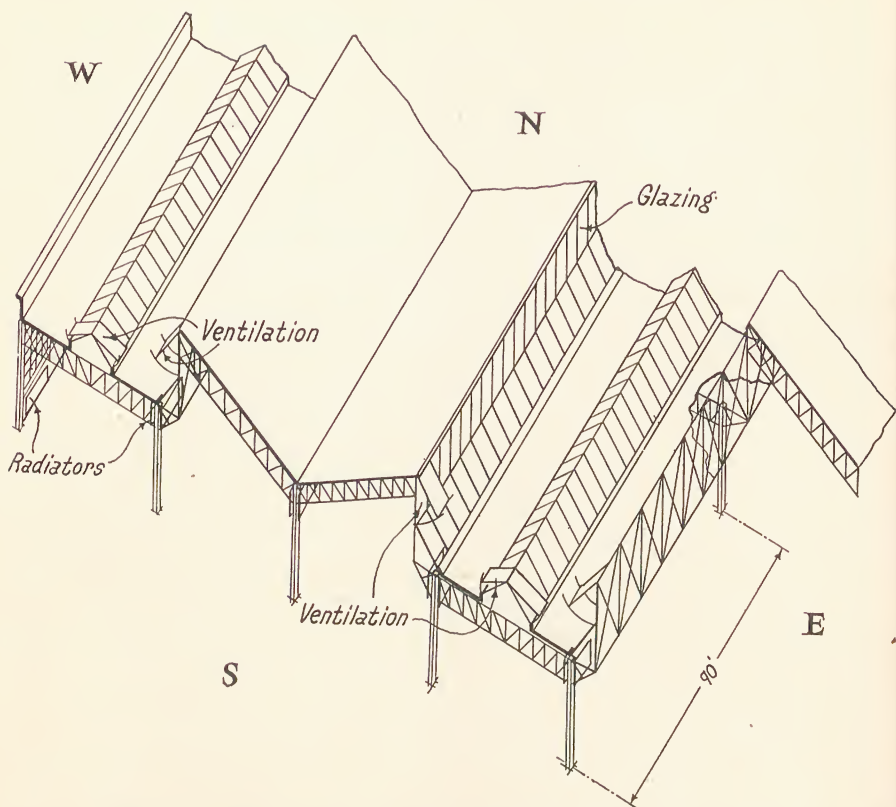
ENLARGED DETAIL OF ROOF CONSTRUCTION FOR FACTORY SHOWN IN THE THIRD DIAGRAM OF FIG. 12. SHOWING THE ORIENTATION AND ALSO VENTILATING ARRANGEMENTS
